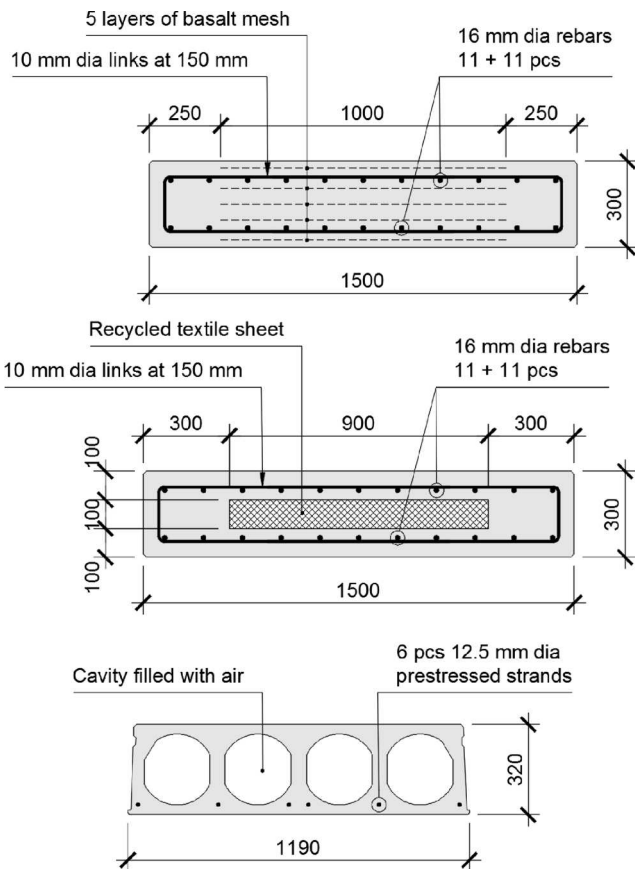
Arrangement of the specimens (from top to bottom Specimen no. 18, 19, 20).
